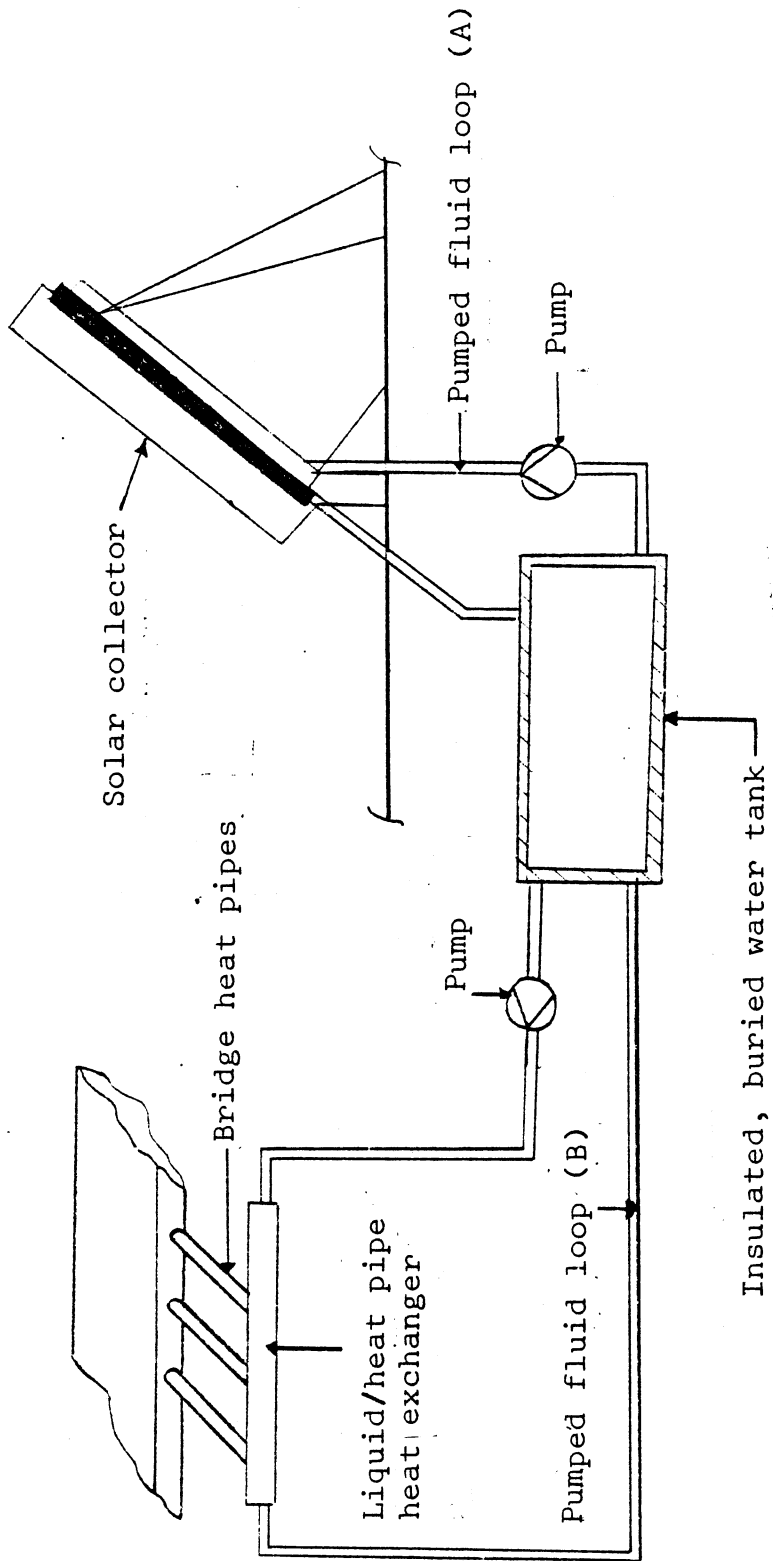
Schematic of solar collector/heat pipe design to prevent icing on highway bridge deck.
